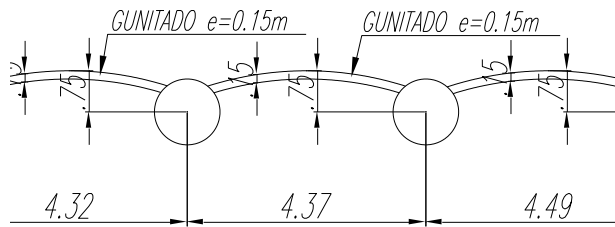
Layout gunning of shotcrete contiguous concrete piles.
